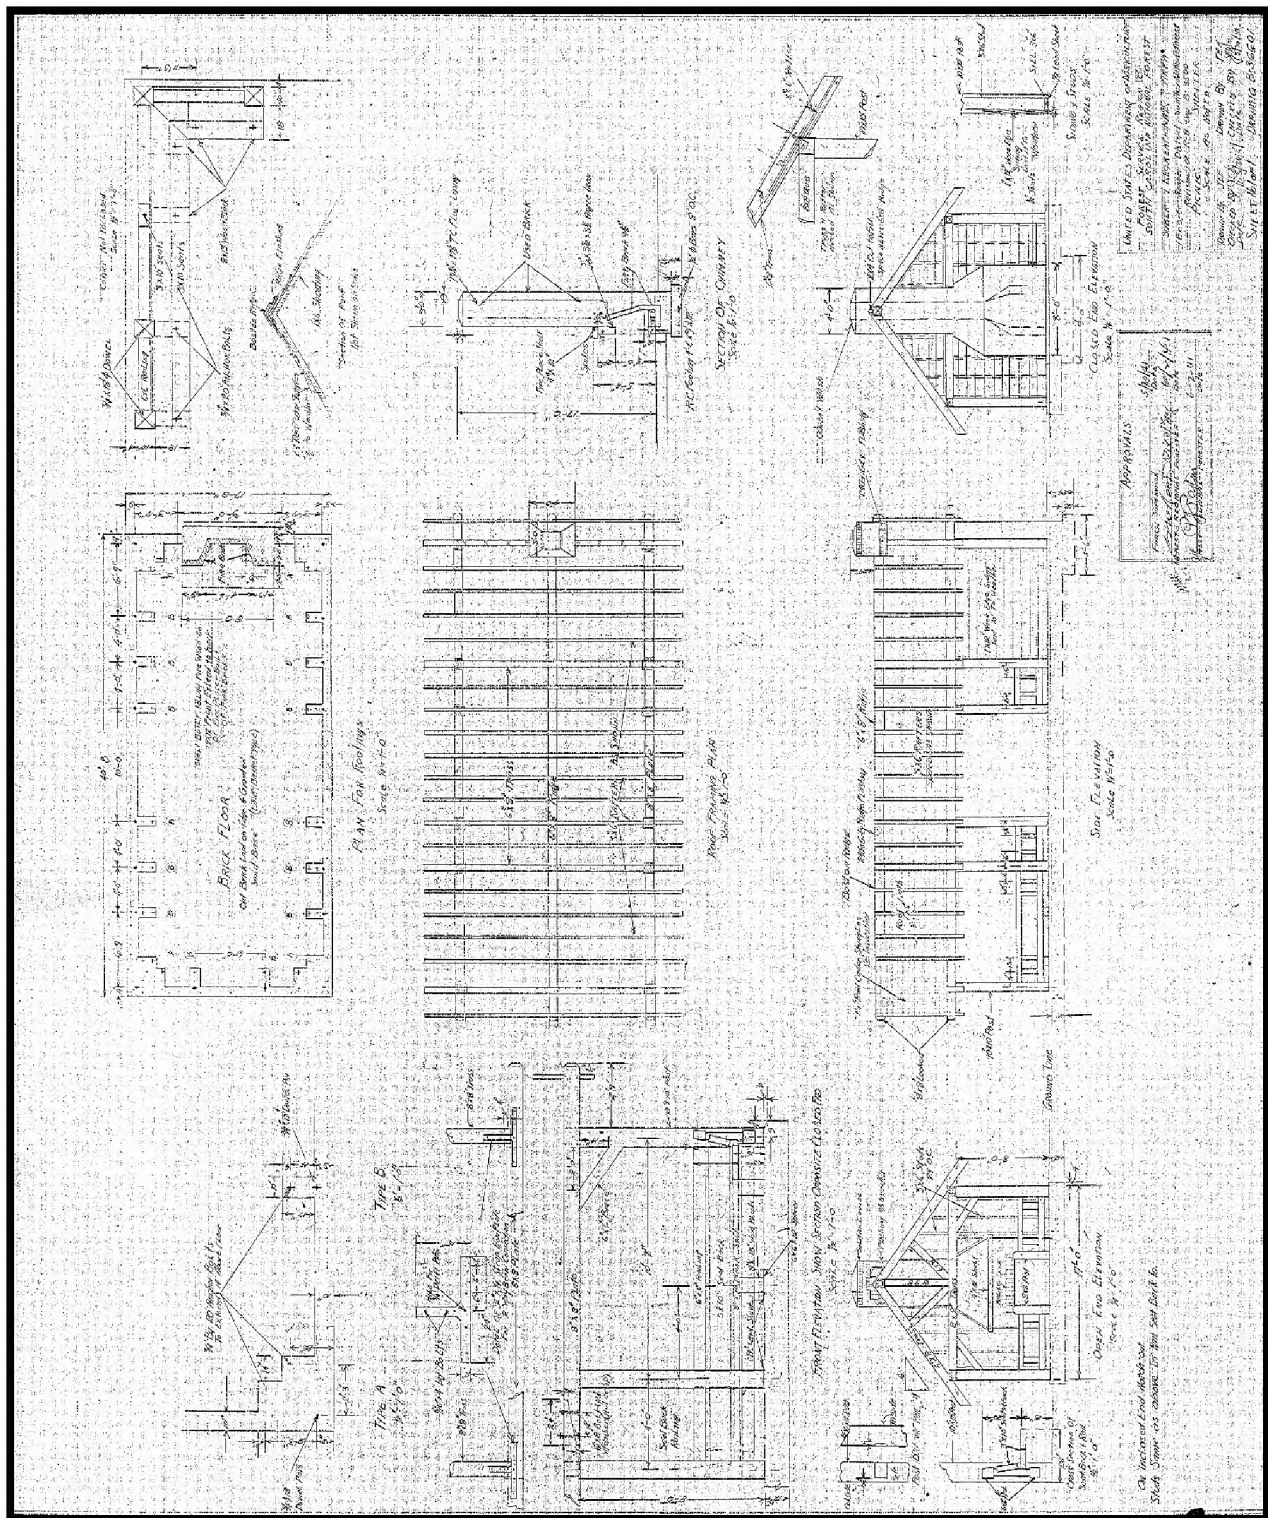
Plan drawing for new picnic shelter at Molly's Rock/Suber Recreation Area (Drawing B-36601).
